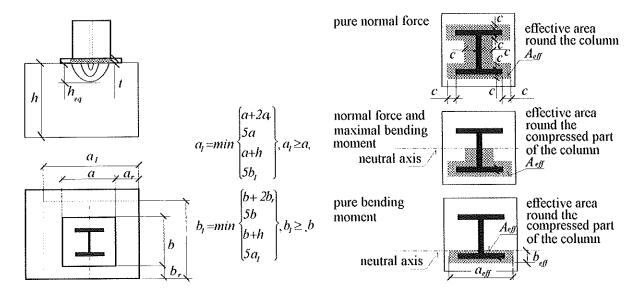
Local deformation of the concrete block, the effective area under the flexible plate
